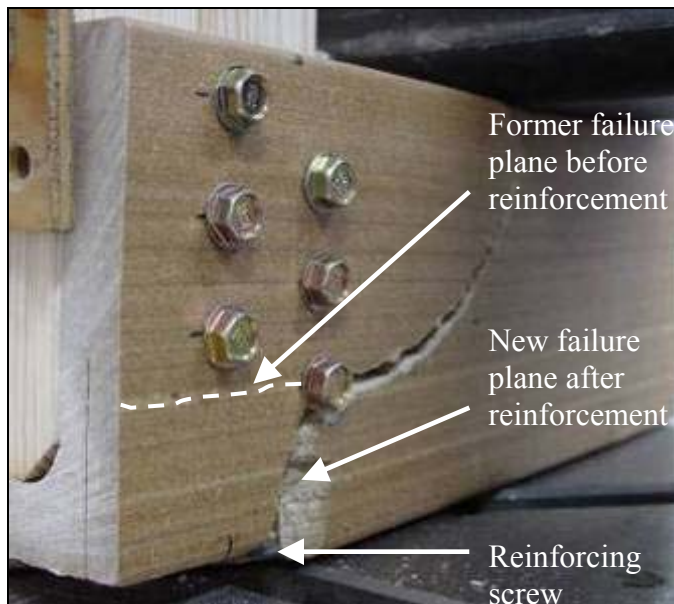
Reinforced sill failure photo (Specimen 10)
